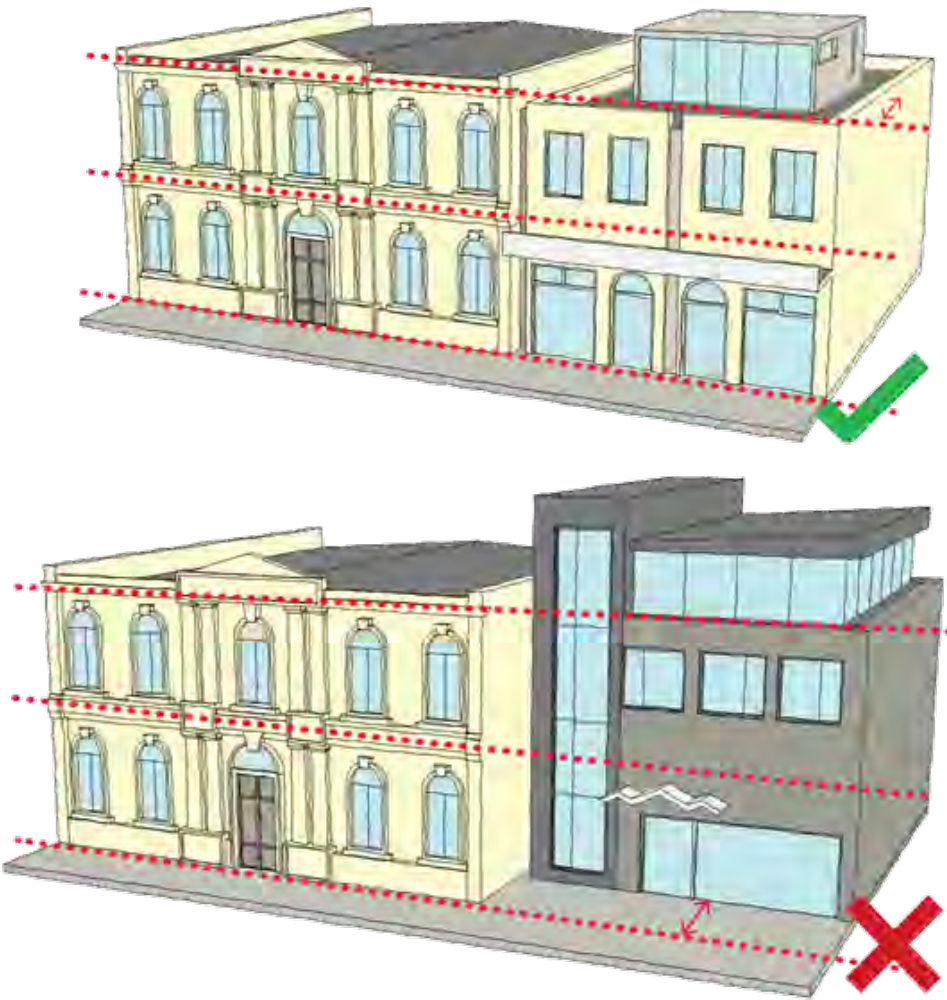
New buildings should respect the existing form, scale and rhythm of adjacent or adjoining heritage buildings and character contributing buildings to reinforce the built heritage values of Ōamaru.
